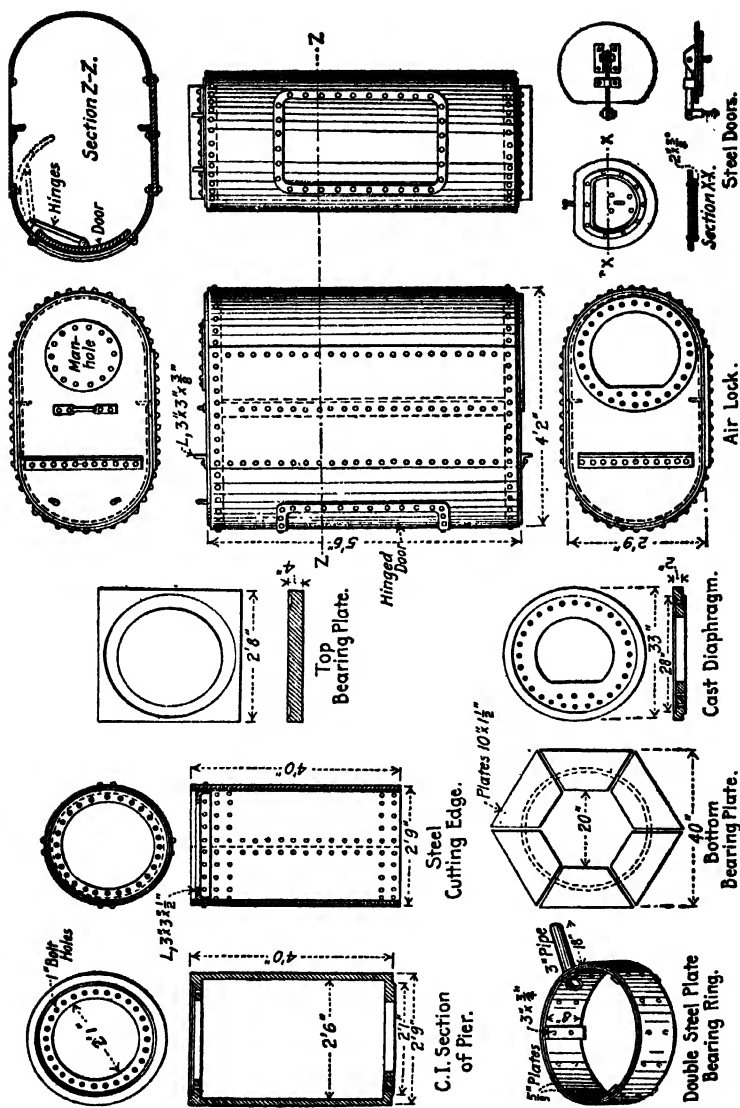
Details of Lower Section of Cylinder, Etc., Used in Underpinning the Stokes Building, New York City.
